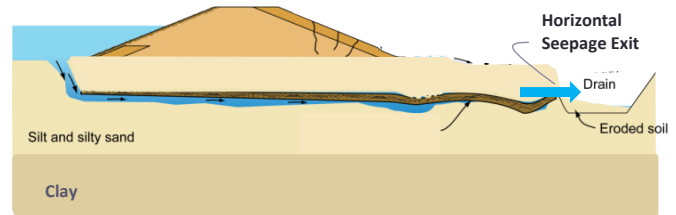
Horizontal Seepage Exit into a Drainage Ditch along the Downstream Toe of an Earth Dam
